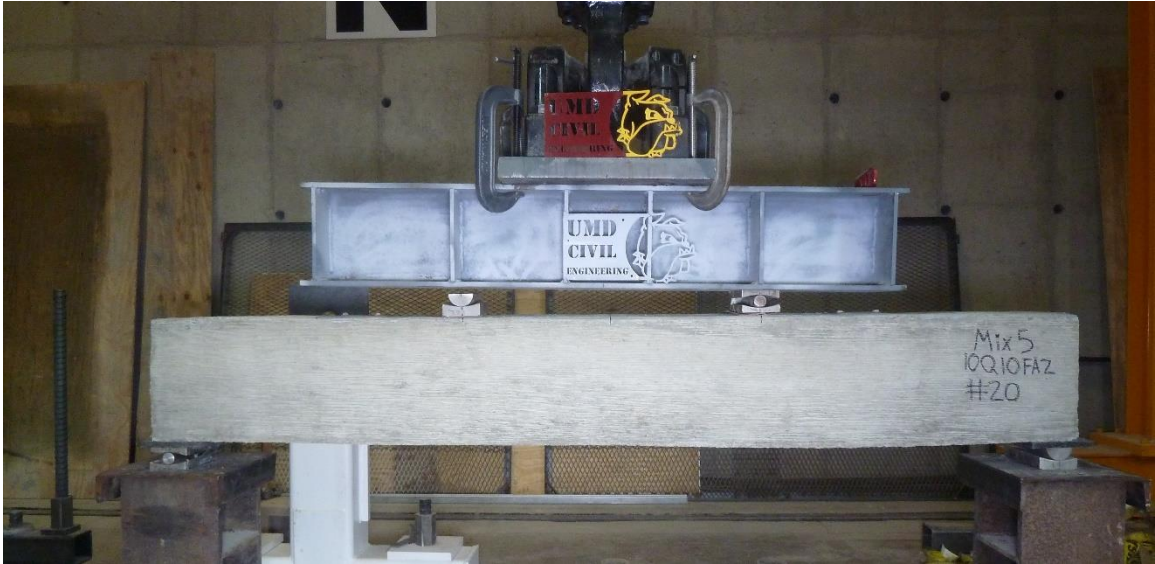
Mixture 5 (10Q10FA2) beam #20: concrete beam before testing.
